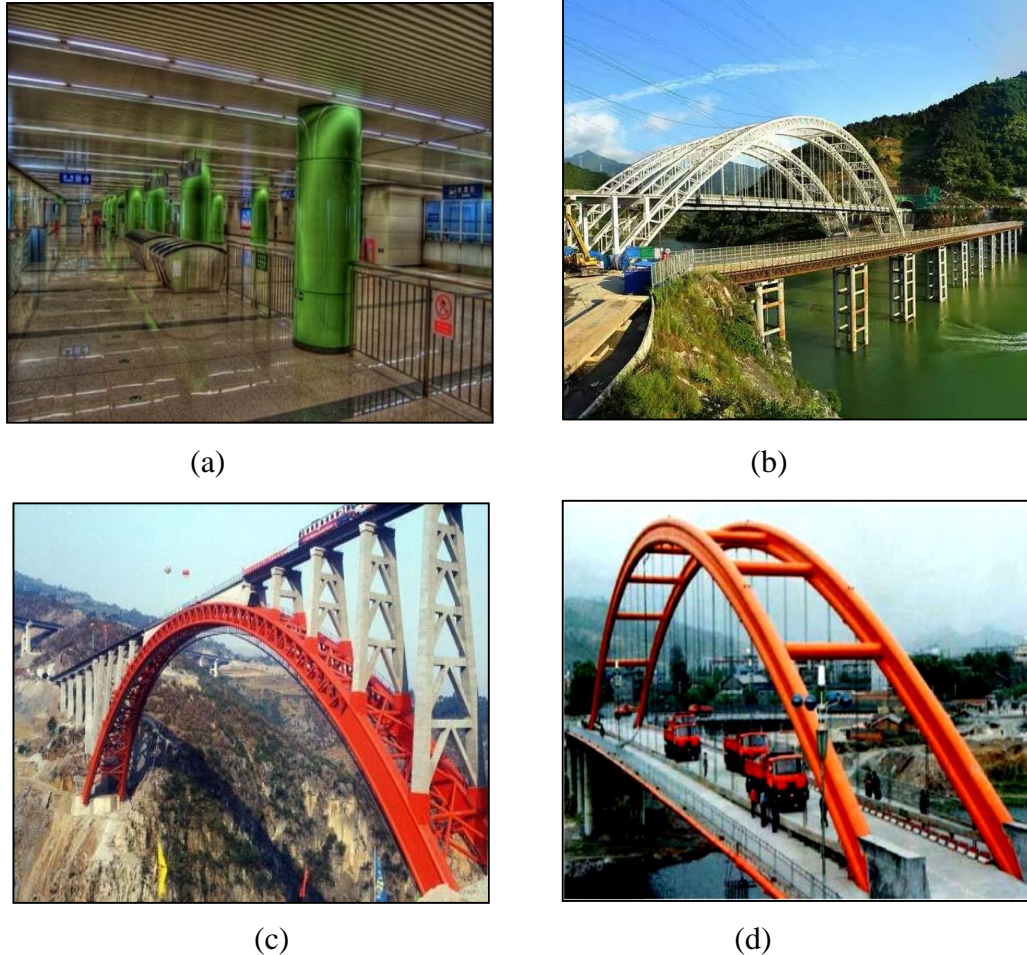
CFST structures, (a) No.1 subway of Beijing (b) Wuxi River bridge (c) Beipanjiang River Railway Bridge (d) Wanchang Bridge (Han et al, 2014)
